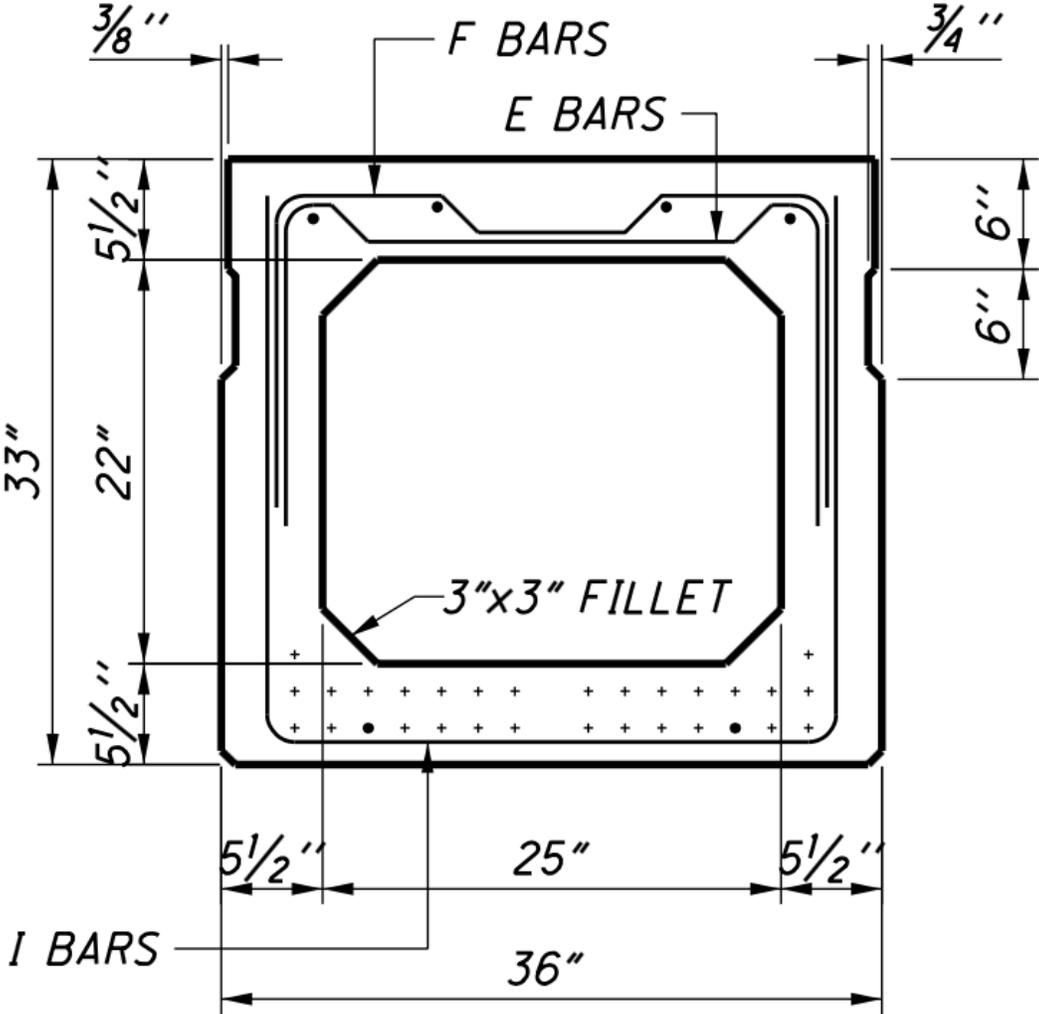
Typical Ohio Precast, Prestressed Box-Beam Girder Details [1]
